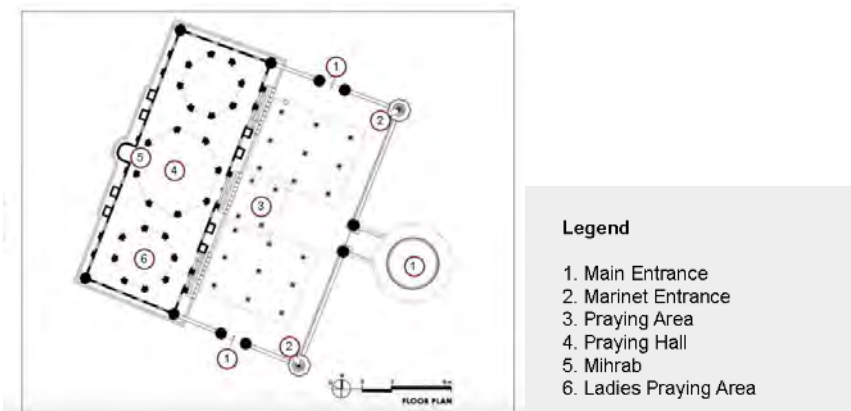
The first-floor plan of Masjid Jamek (oldest one)
